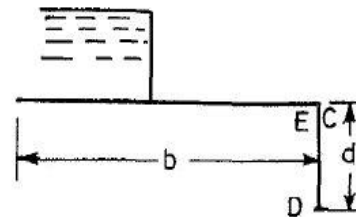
c. A straight horizontal floor having sheet pile on the d/s end
